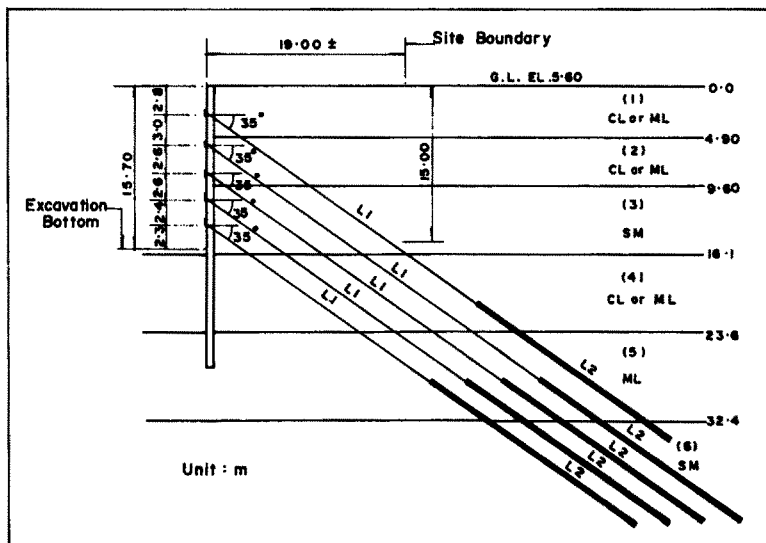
Excavation Retaining System at the New NTU Hospital in Taipei.
